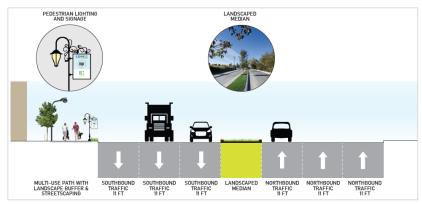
Segment A: Proposed Typical Section (Minus Avenue to Oak Street)
